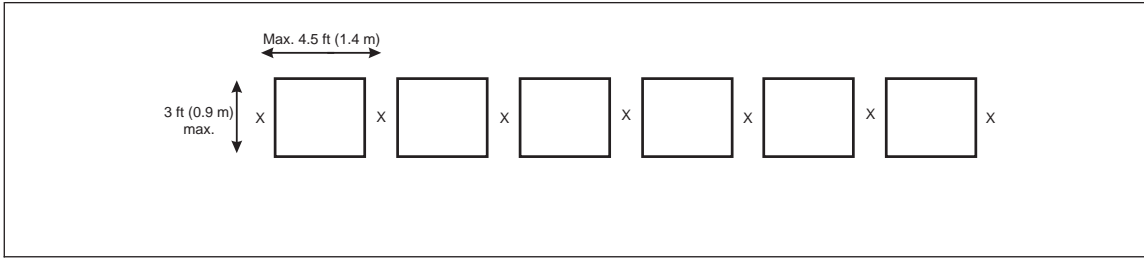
Plan view of alternative in-rack sprinkler arrangement for single-row racks up to 3 ft (0.9 m) deep
